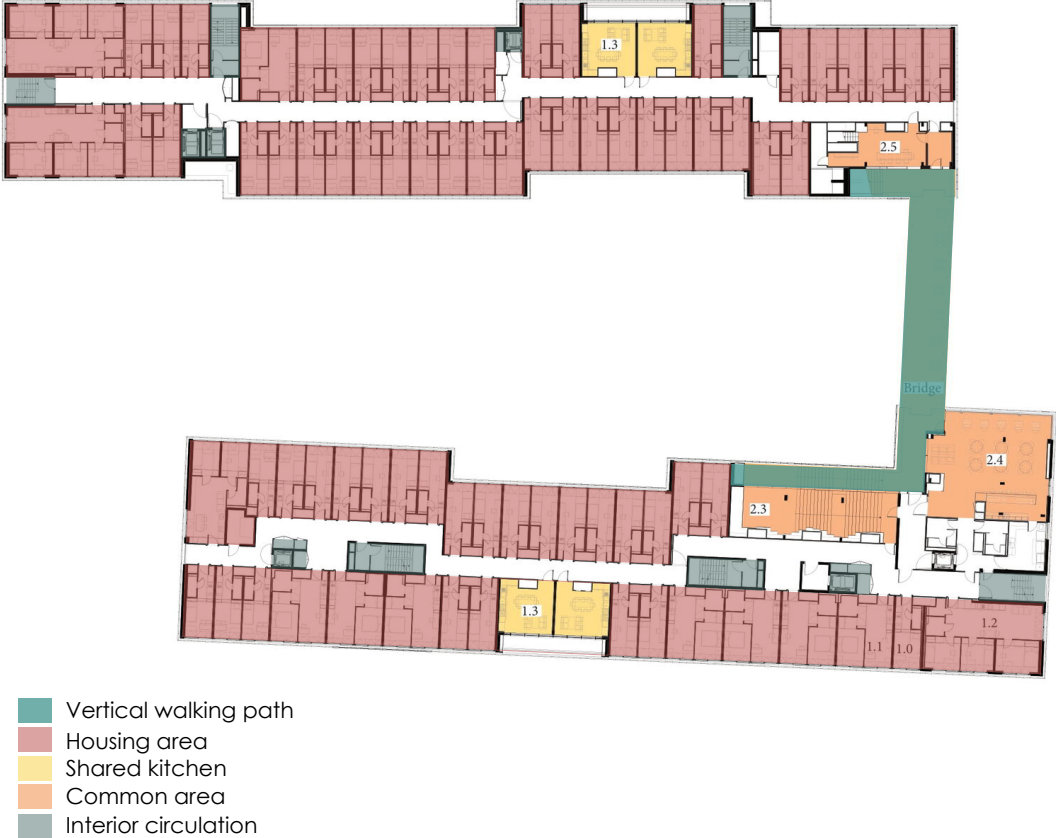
3rd floorplan (Adapted from Kengo Kuma & Associates by author)
